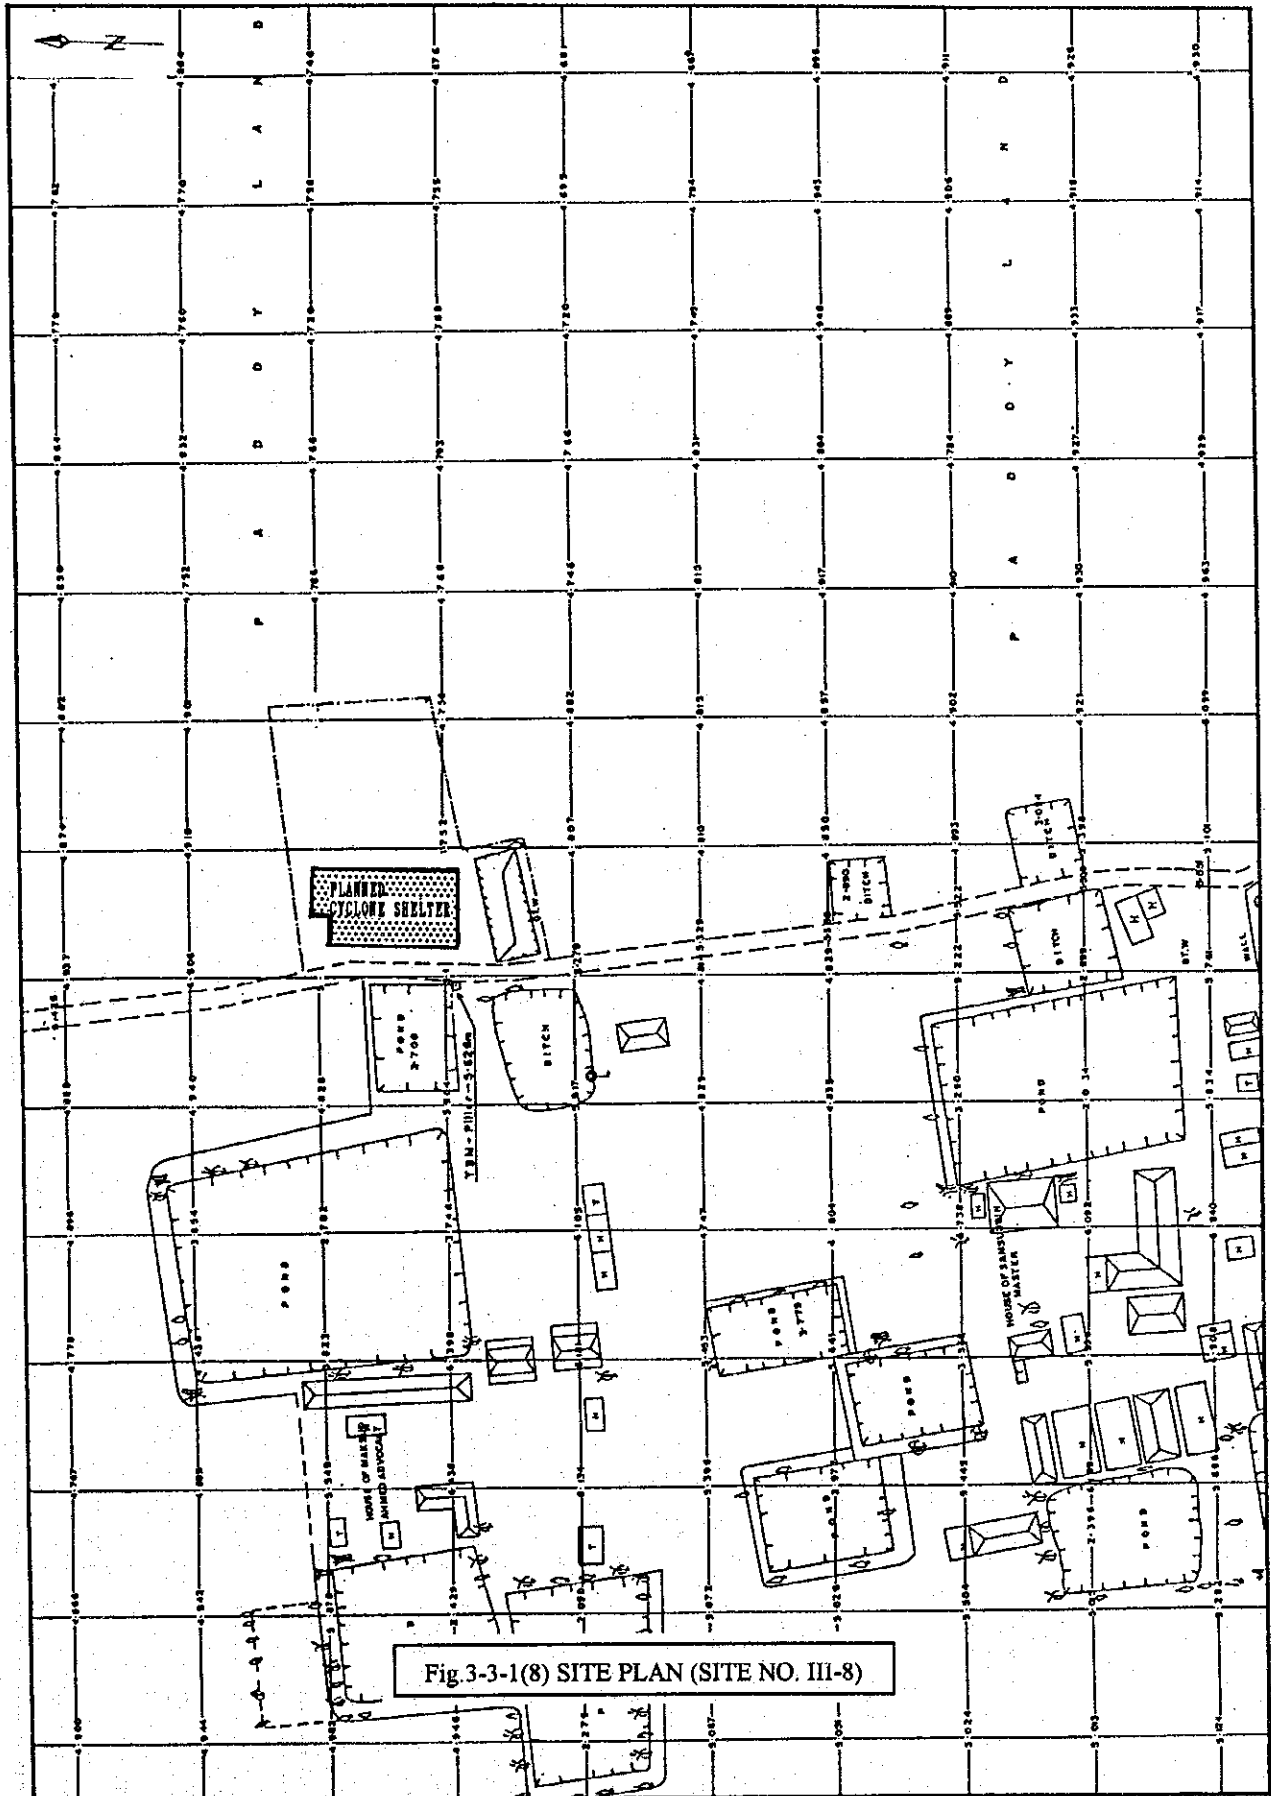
(8) SITE PLAN (SITE NO. III-8)
